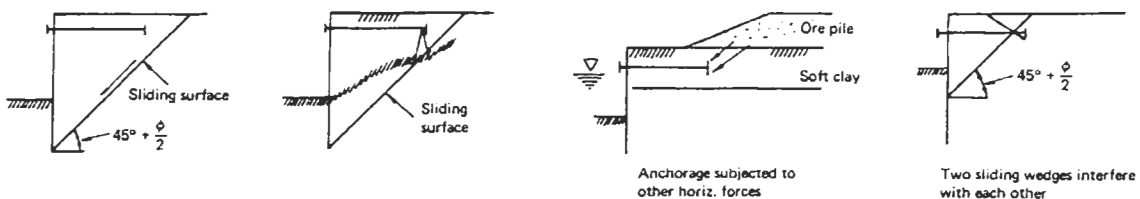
Installations having reduced anchorage capacity (after Teng¹)
